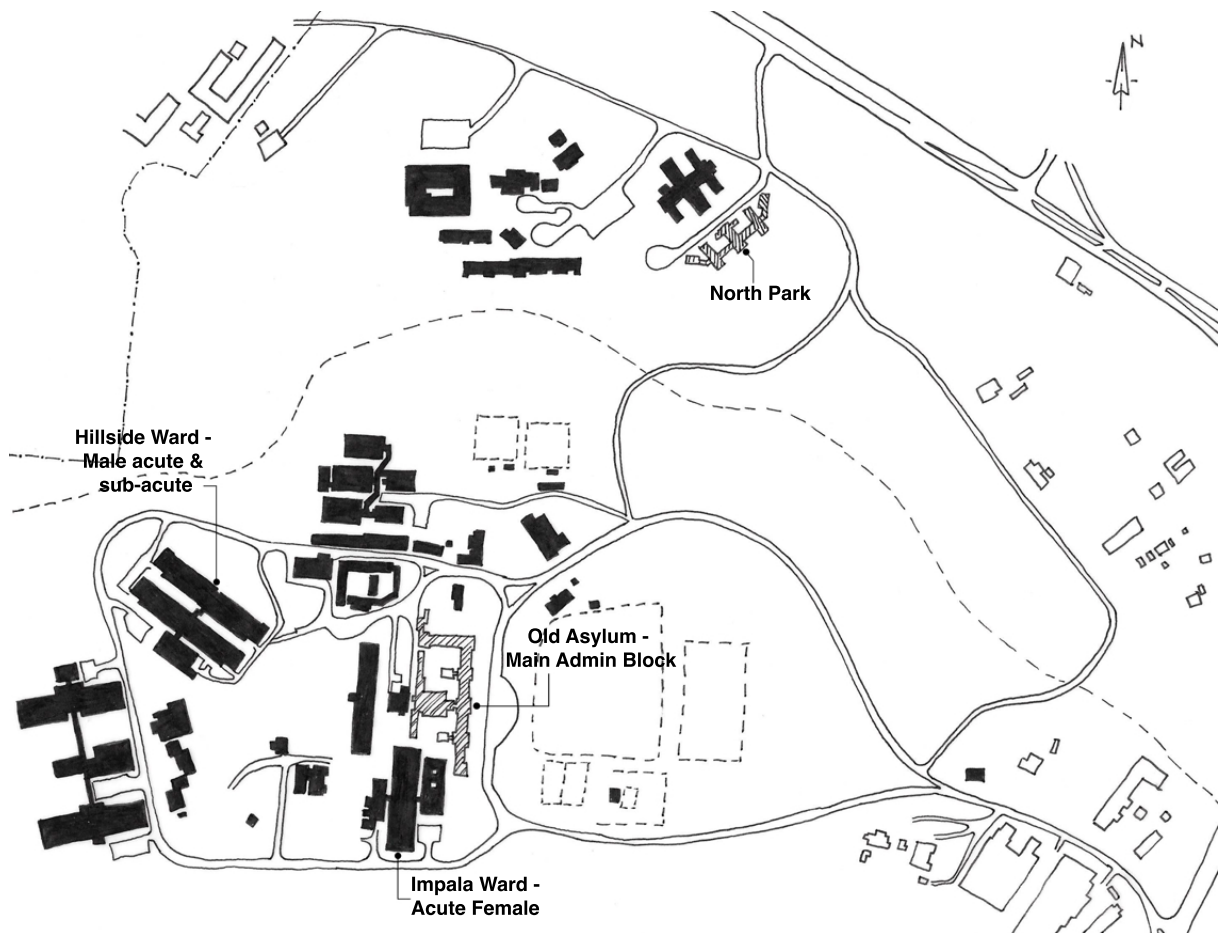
Town Hill Hospital Site Plan. Adapted diagram of L & R Architects, 2013. Author's Own, 2016.
